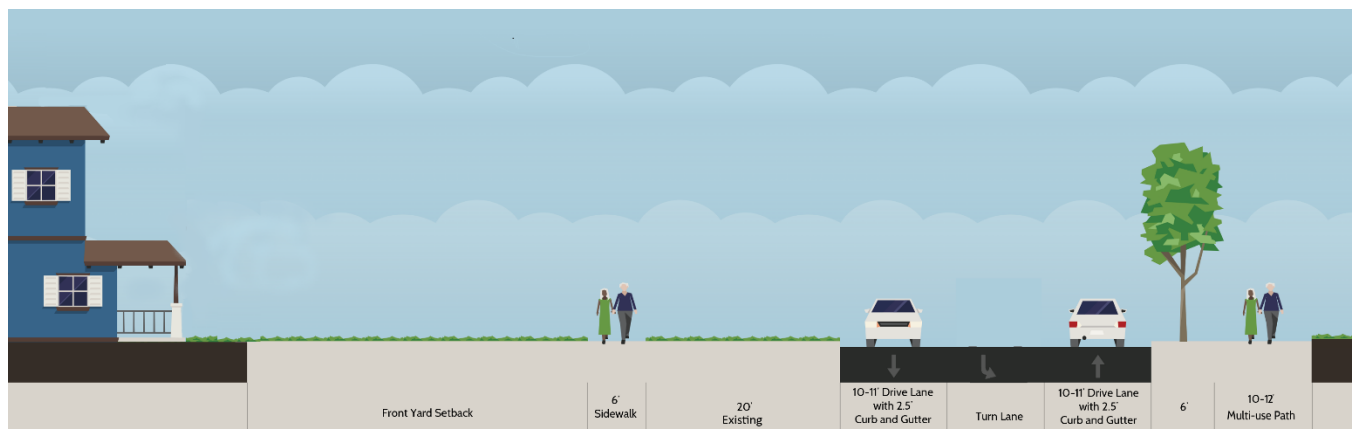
Proposed S Hagan Bridge Rd Typical Section, Looking North from Brian Mainor Rd
